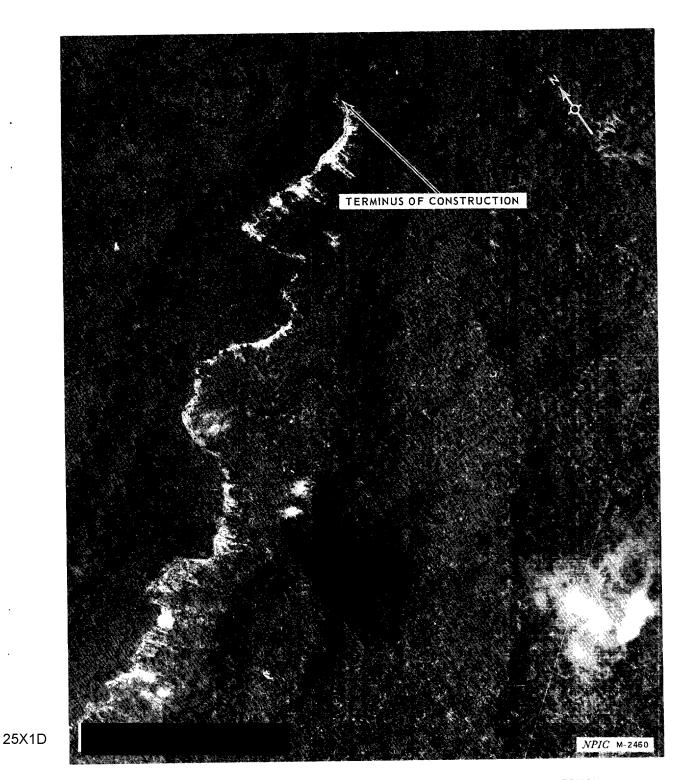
NEW ROAD UNDER CONSTRUCTION, TA BAT AREA, SOUTH VIETNAM
